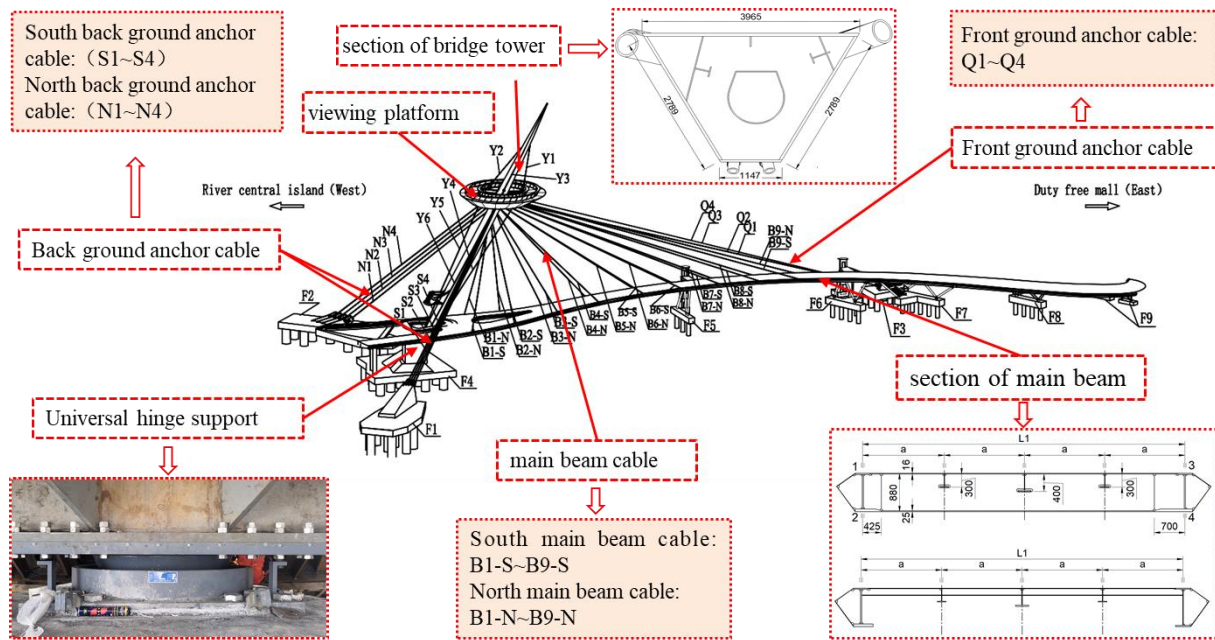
Schematic diagram of the Sanya Landscape Bridge (unit: mm).
